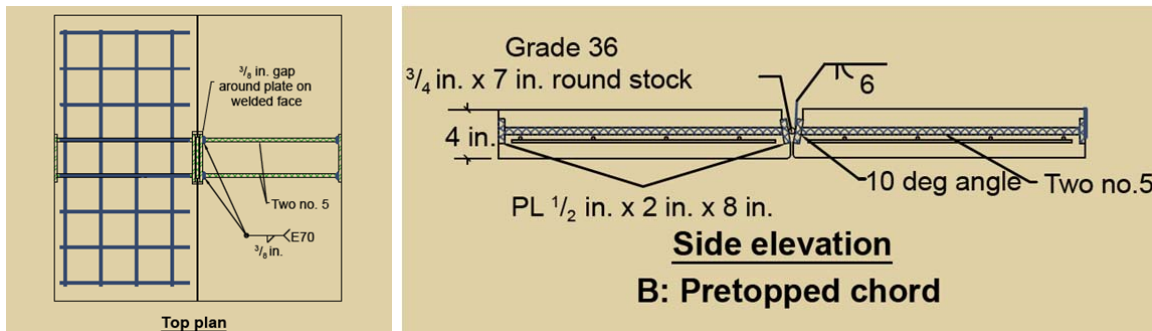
second type of connection tested by Naito and Cao (steel plate embedded in each slabs and metal slug)
